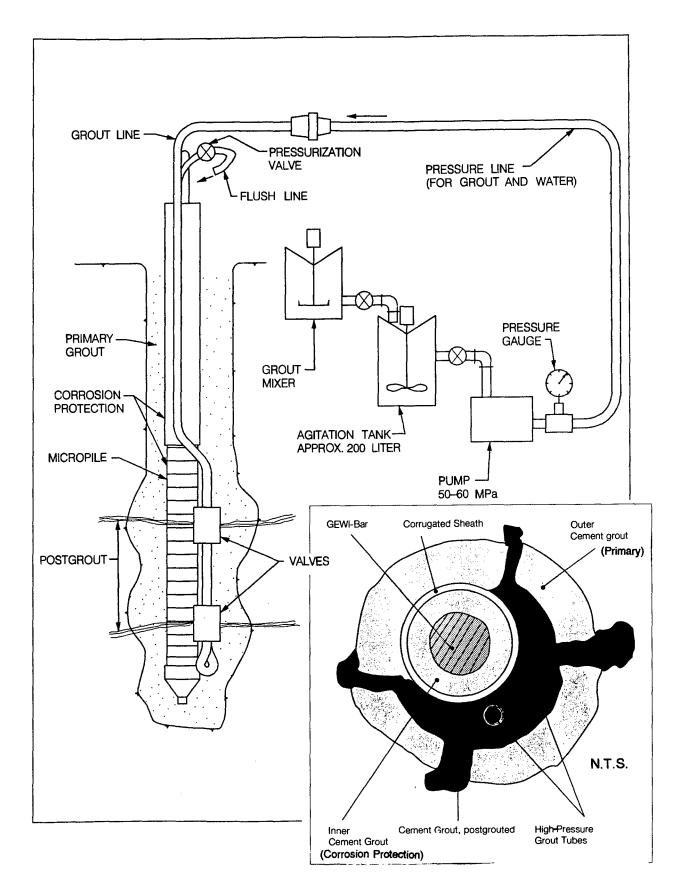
Elevation (schematic) and cross section of "loop-type" post-grouting system (DSI, 1992).
